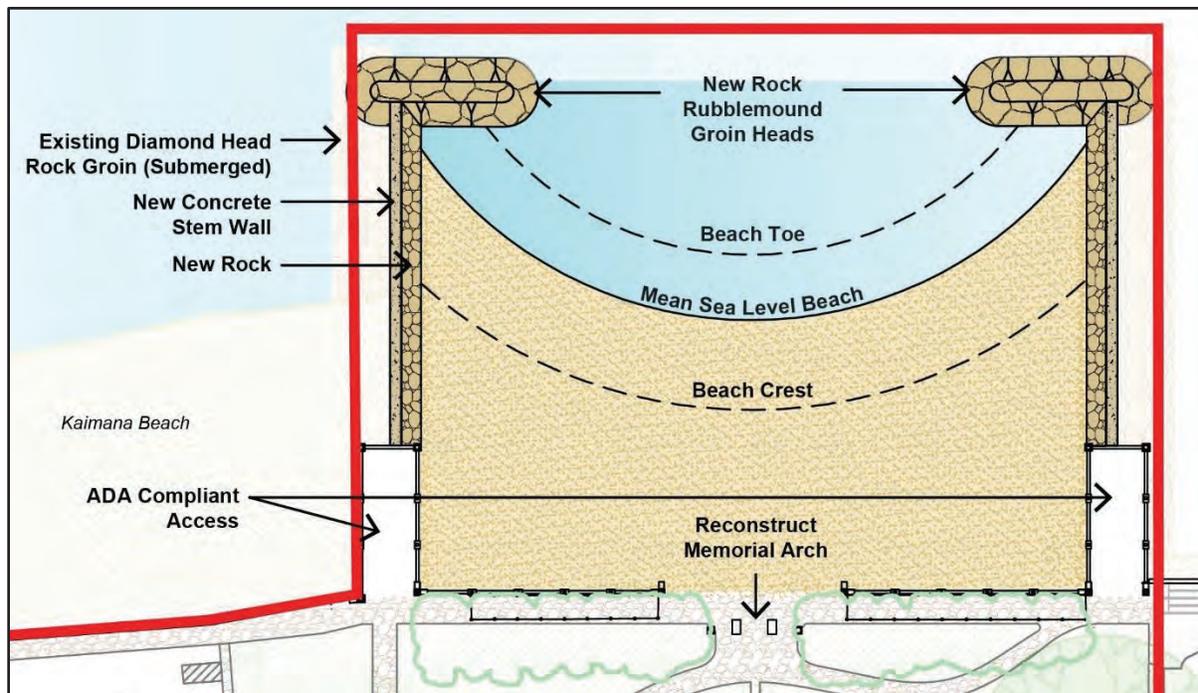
Alternative 2 – War Memorial Beach, plan view.
